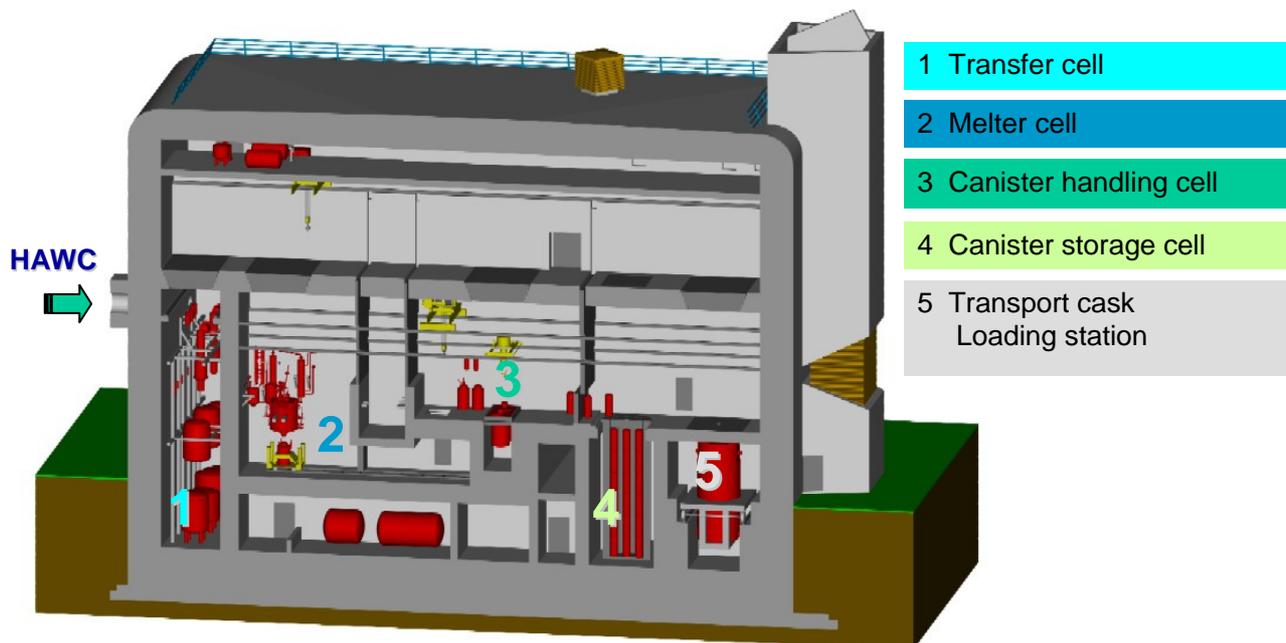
Layout of the vitrification facility, longitudinal cut.
